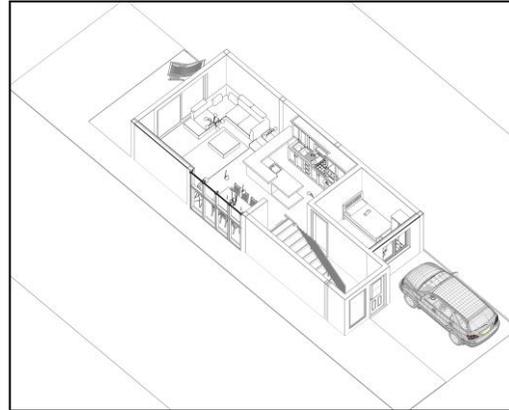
Ground floor 3D plan in stage two – bold lines show created elements
